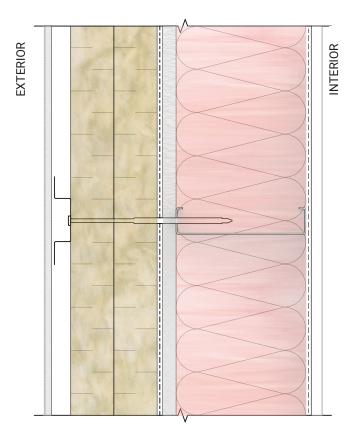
Plan view of a steel-stud framed wall assembly with Thermafiber[®] RainBarrier[®] ci High Compressive (HC) exterior insulation and a direct strapping attachment solution. Cladding is supported by vertical strapping attached back to the steel-stud framed wall assembly using long screws. PINK NEXT GEN® FIBERGLAS® or mineral wool batt insulate the framed wall cavity.
